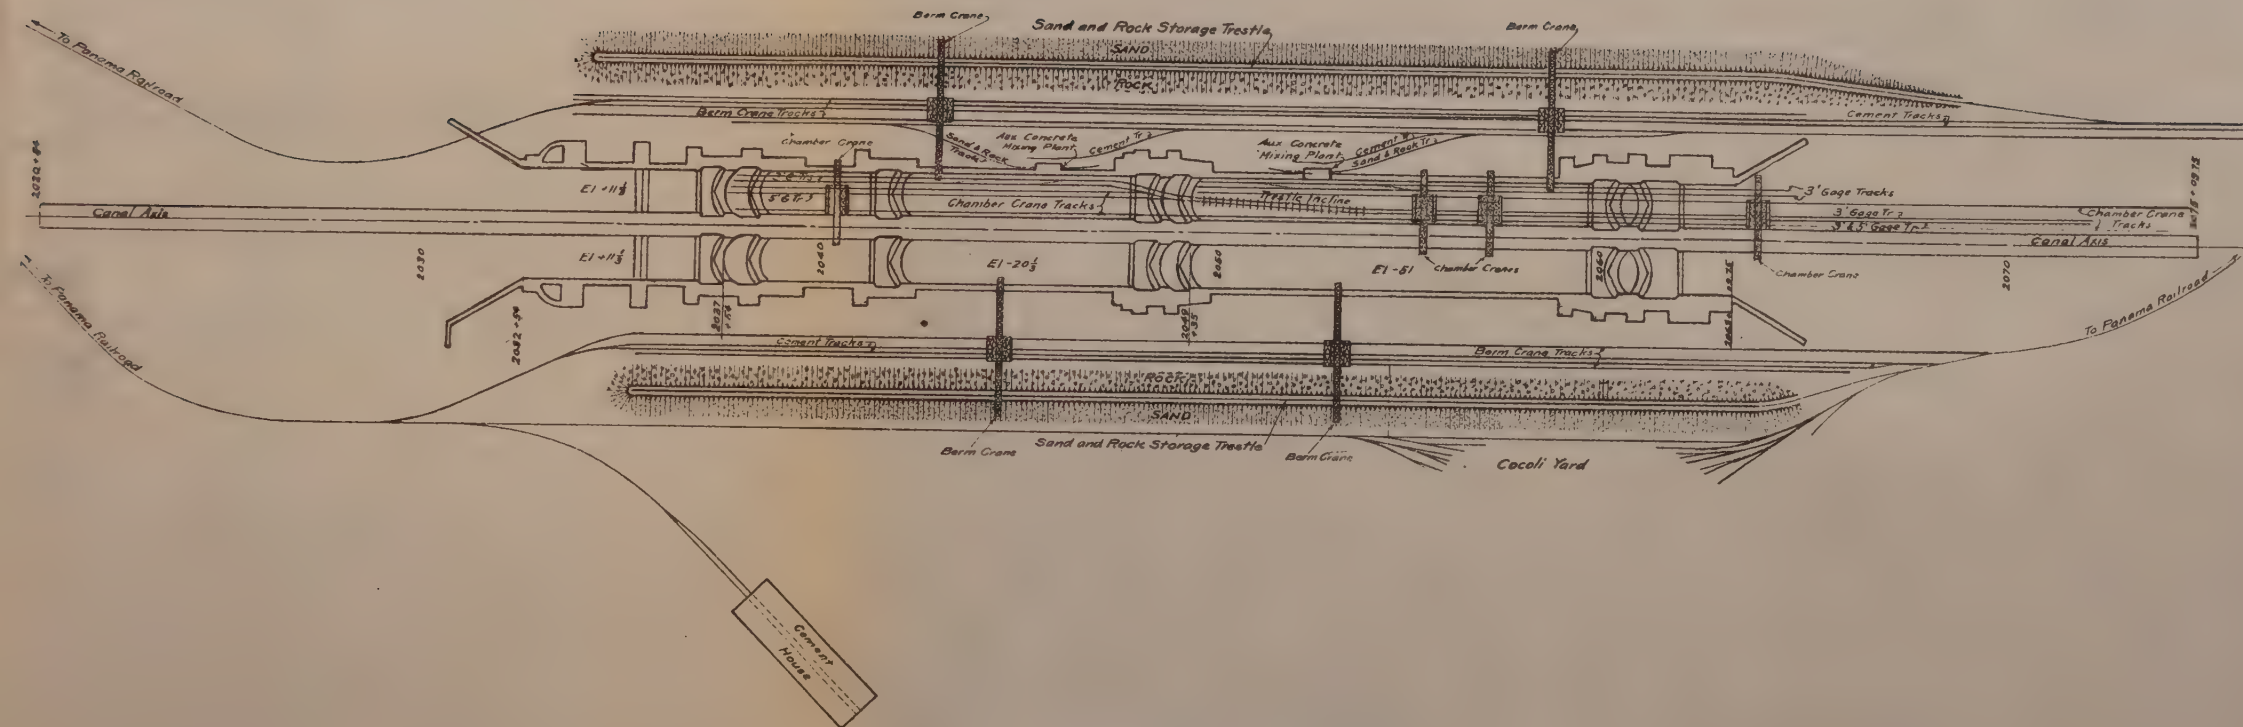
Plate X. Layout of Concrete Handling Plant at Miraflores Locks.
